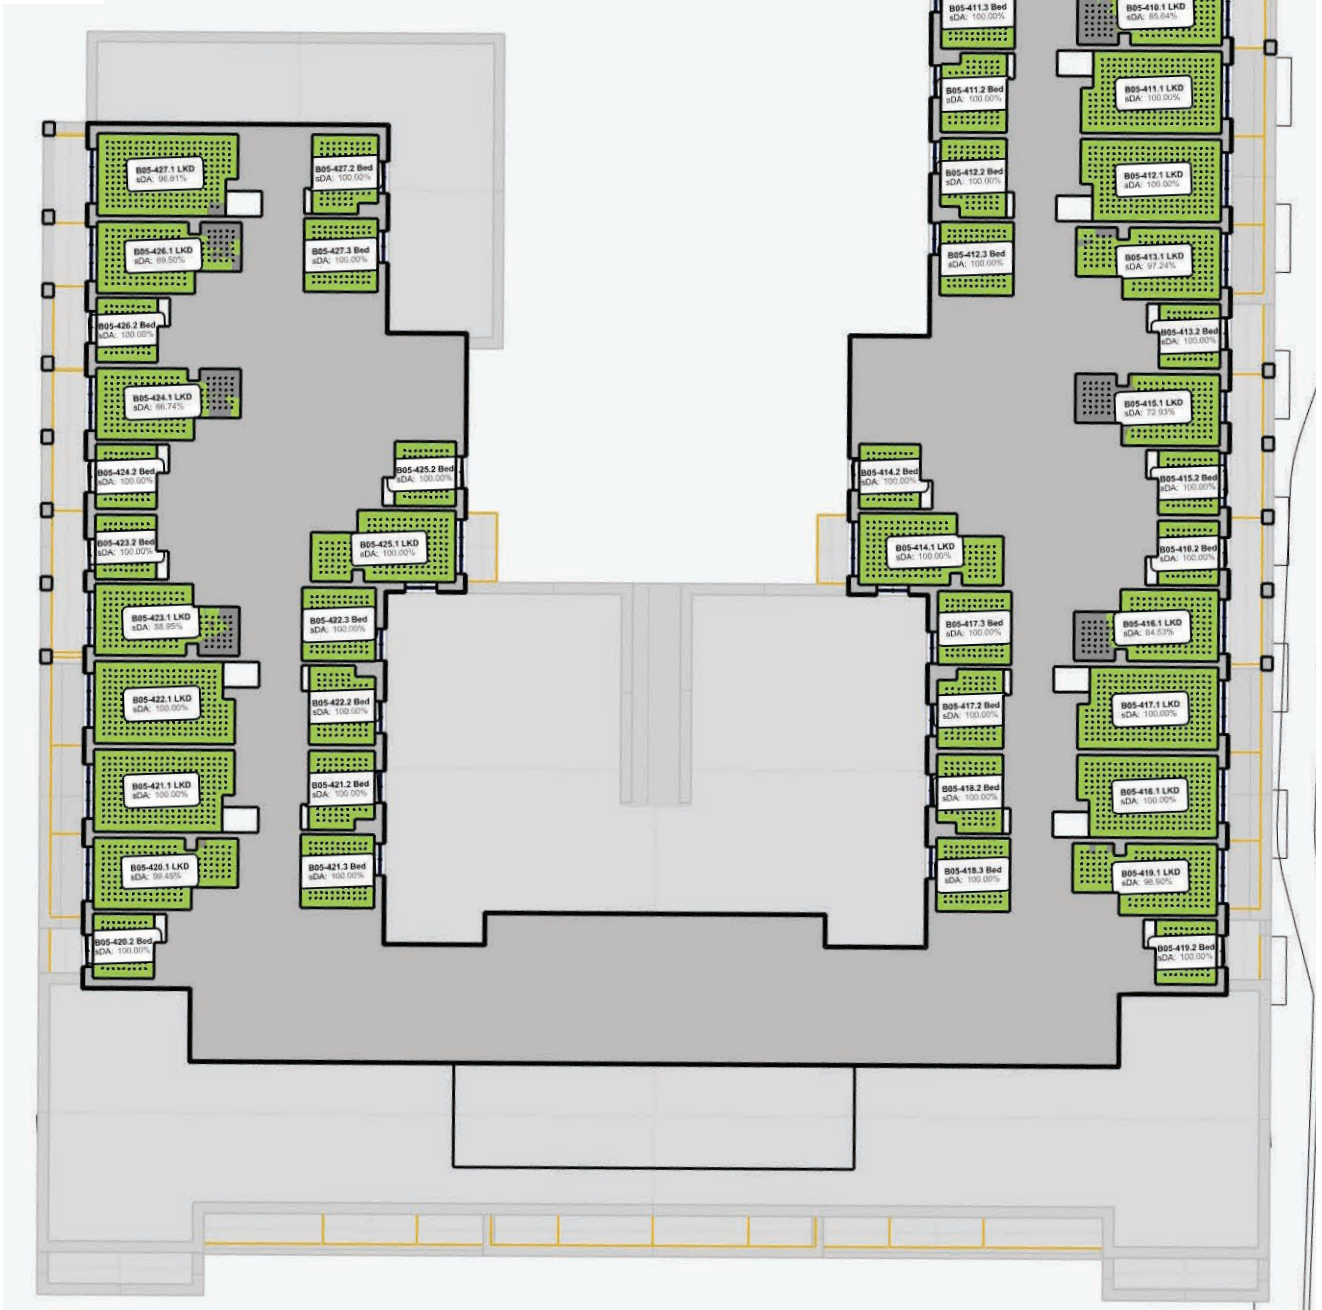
Site 5 - Floor plans indicating Daylight Provision to BS EN17037:2021+A1 Table NA.1
